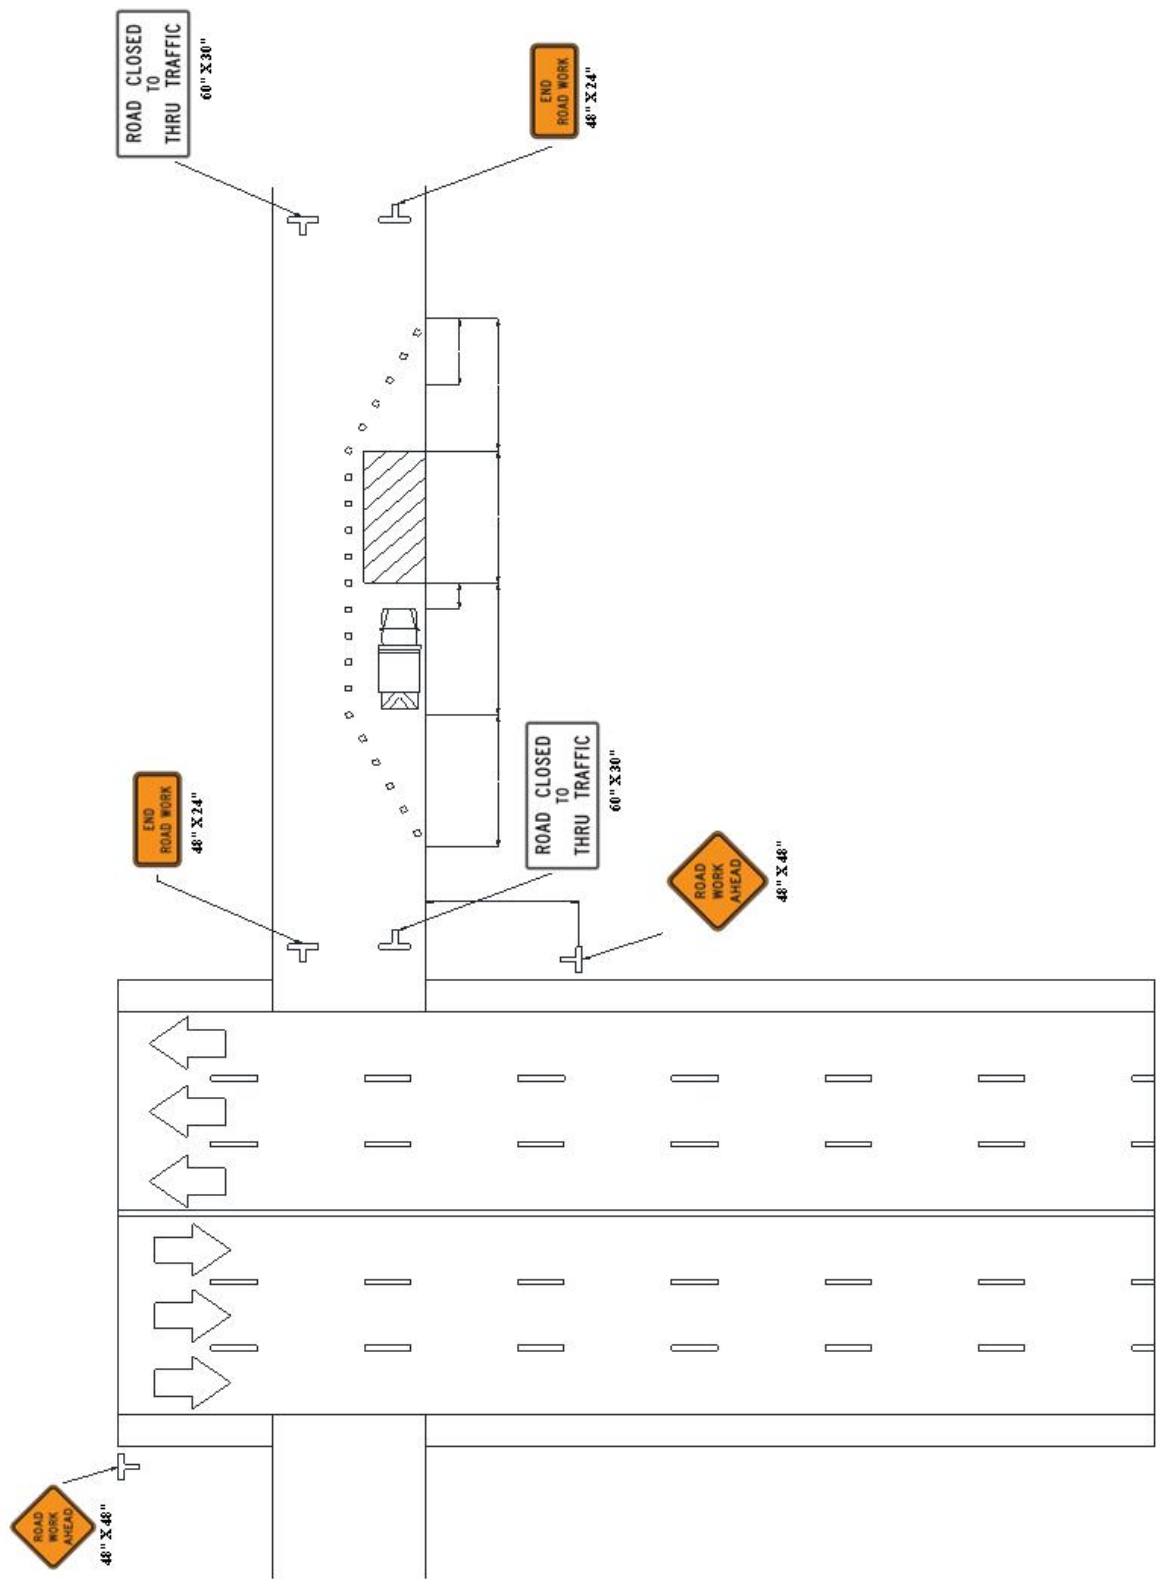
Traffic Control Plan 4 (Station 5+00 to station 7+00, station 30+00 to station 34+00, station 87+00 to station 91+00)
